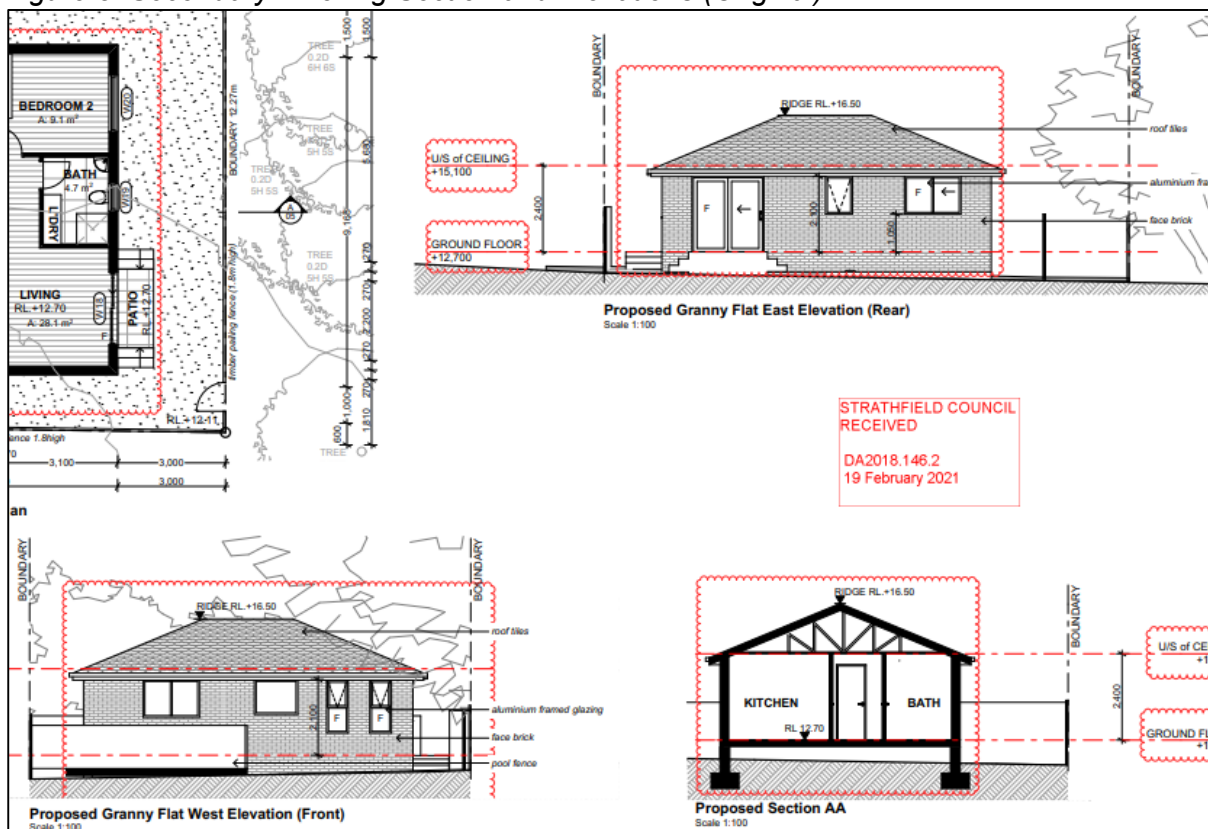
Secondary Dwelling Section and Elevations (Modified)
